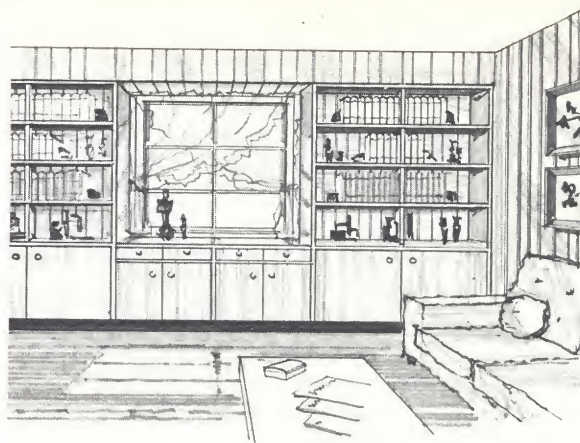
Built-in bookshelves conserve floor space. (Home Planners, Inc.)
